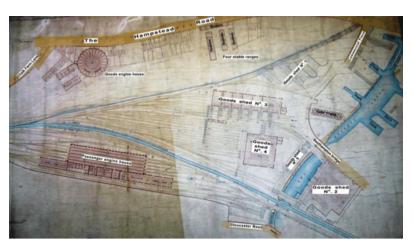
1852 Railway Track Plans (Nationals Archives)
